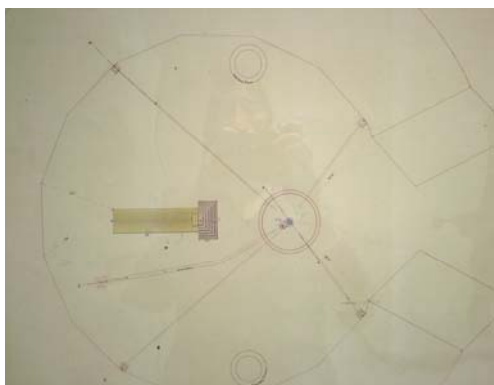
Plan and section of proposed cistern at Castle Williams, 1859.
